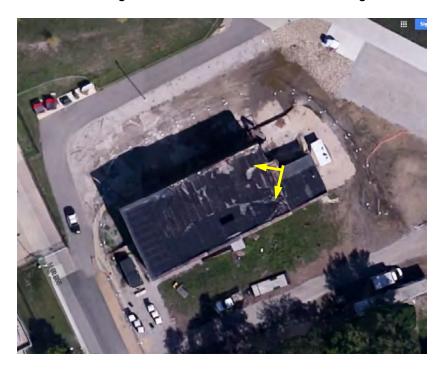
Areal view of Knutson Building roof. The arrows point to an area of the roof that collapsed after this view was taken. Google Maps © 2015.
